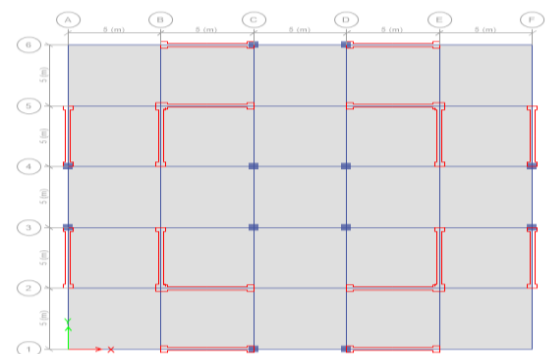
Position of Dumbel Shape Shear wall in Building at 2nd Grid Type
